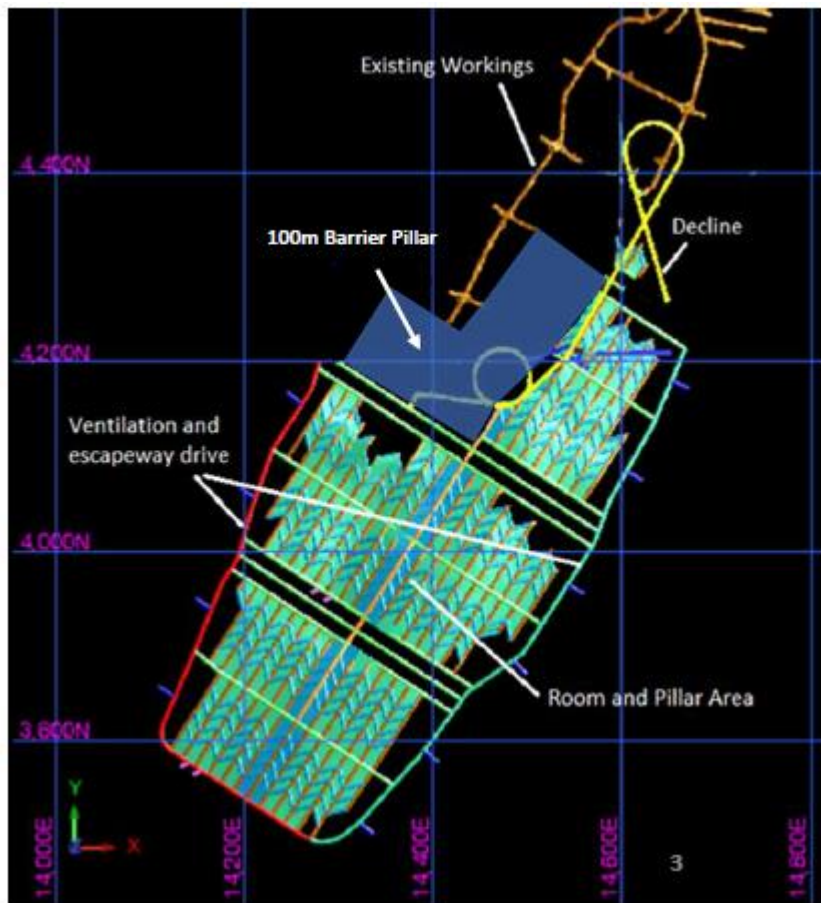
Proposed Underground Workings Relative to the Barrier Pillar.
